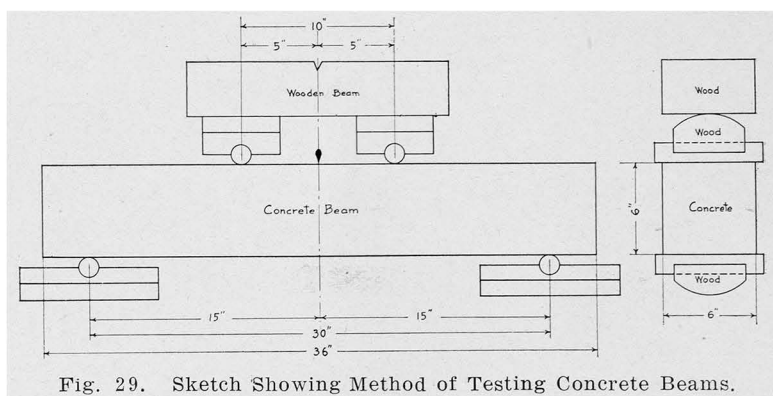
Sketch Showing Method of Testing Concrete Beams.
